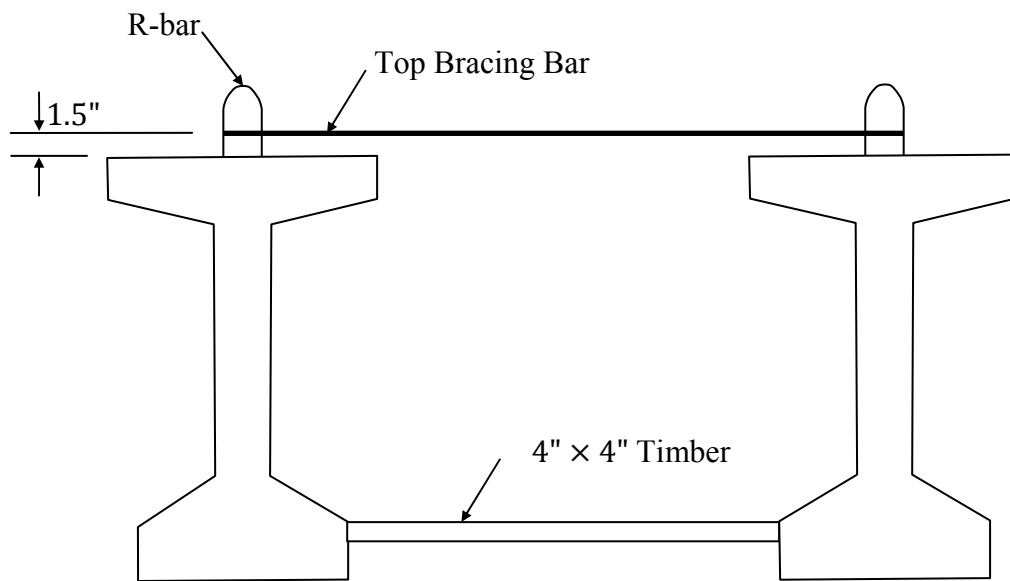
TxDOT Standard Drawing for Girder Bracing
